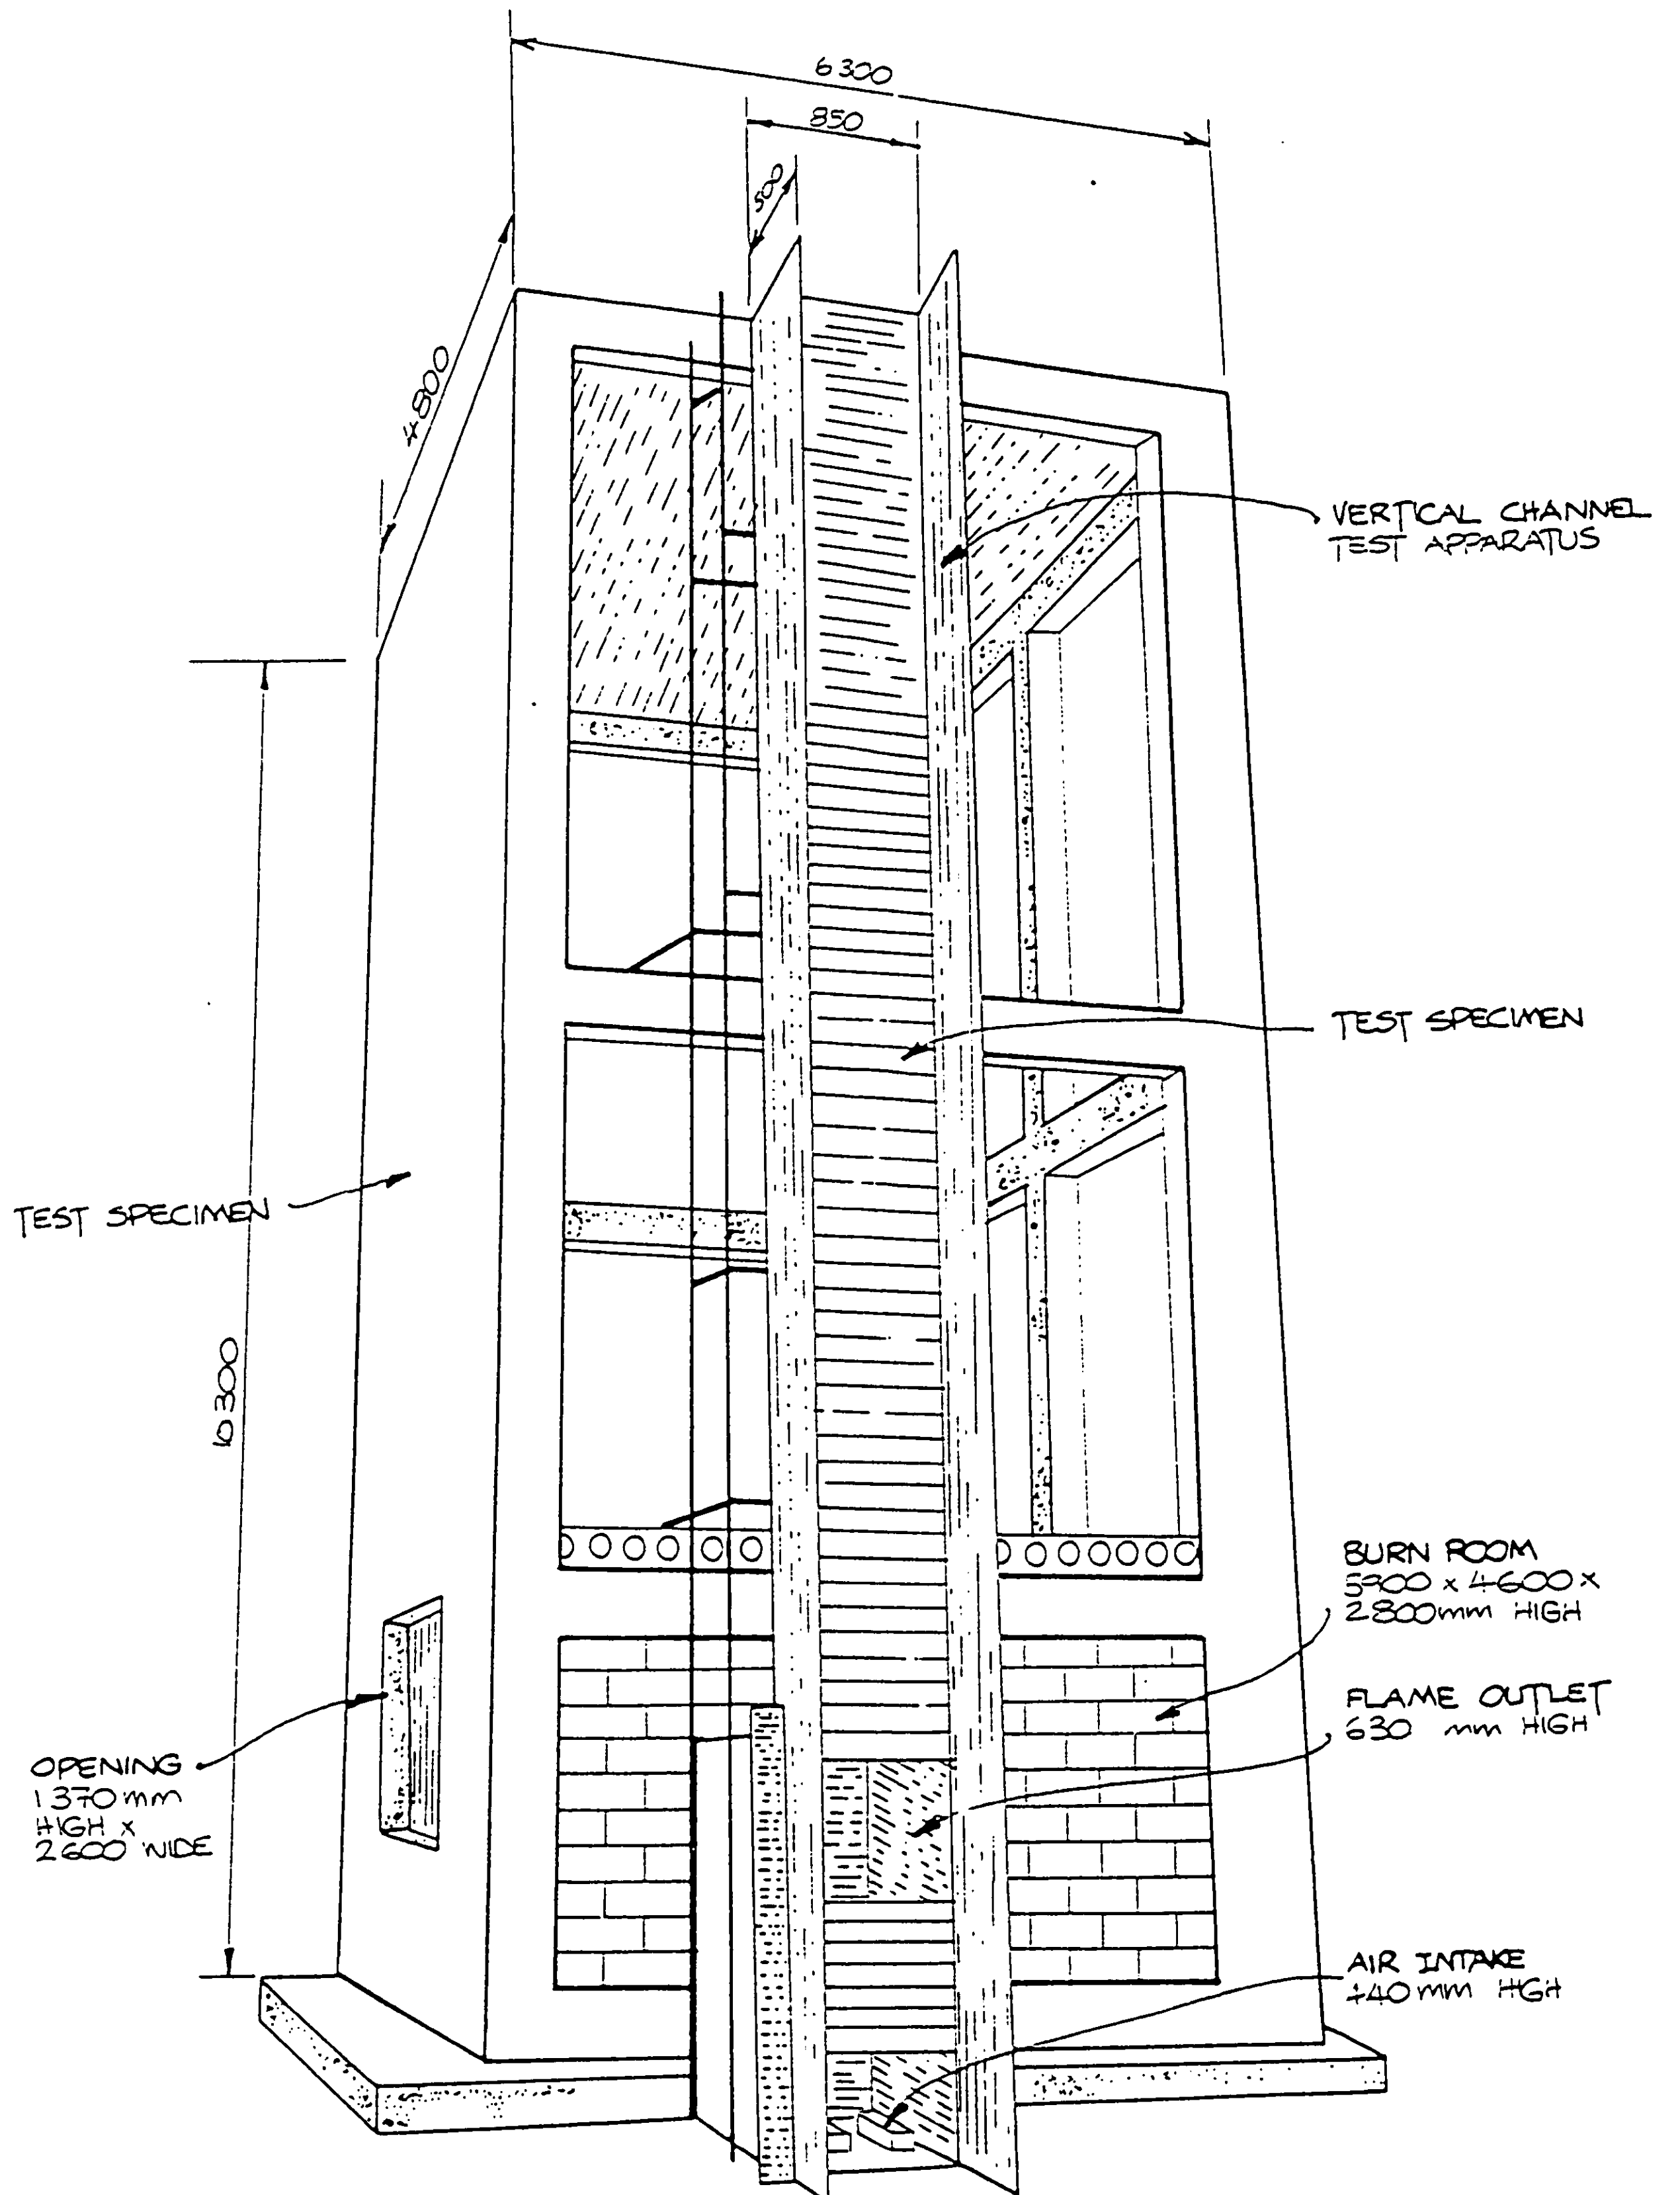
EXTERIOR WALL FIRE TEST FACILITY AND VERTICAL CHANNEL FLAME SPREAD TEST APPARATUS
